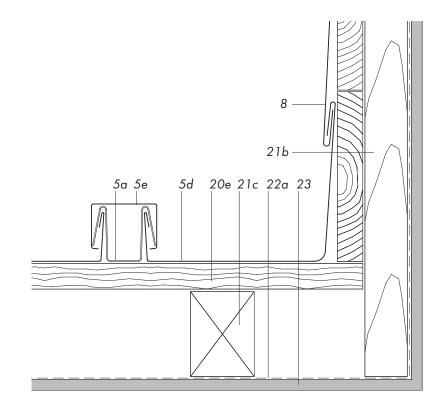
Detail of wall connection to RHEINZINK-Flat Lock Tile facade
